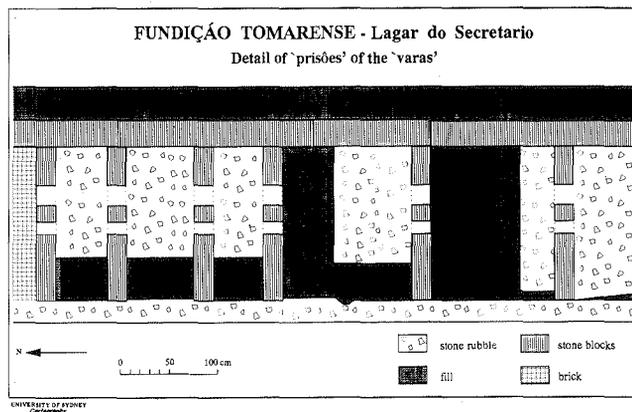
Detailed elevation of the eastern wall of the former *lagar do Secretario* showing the footings for the olive-pressing beams.
